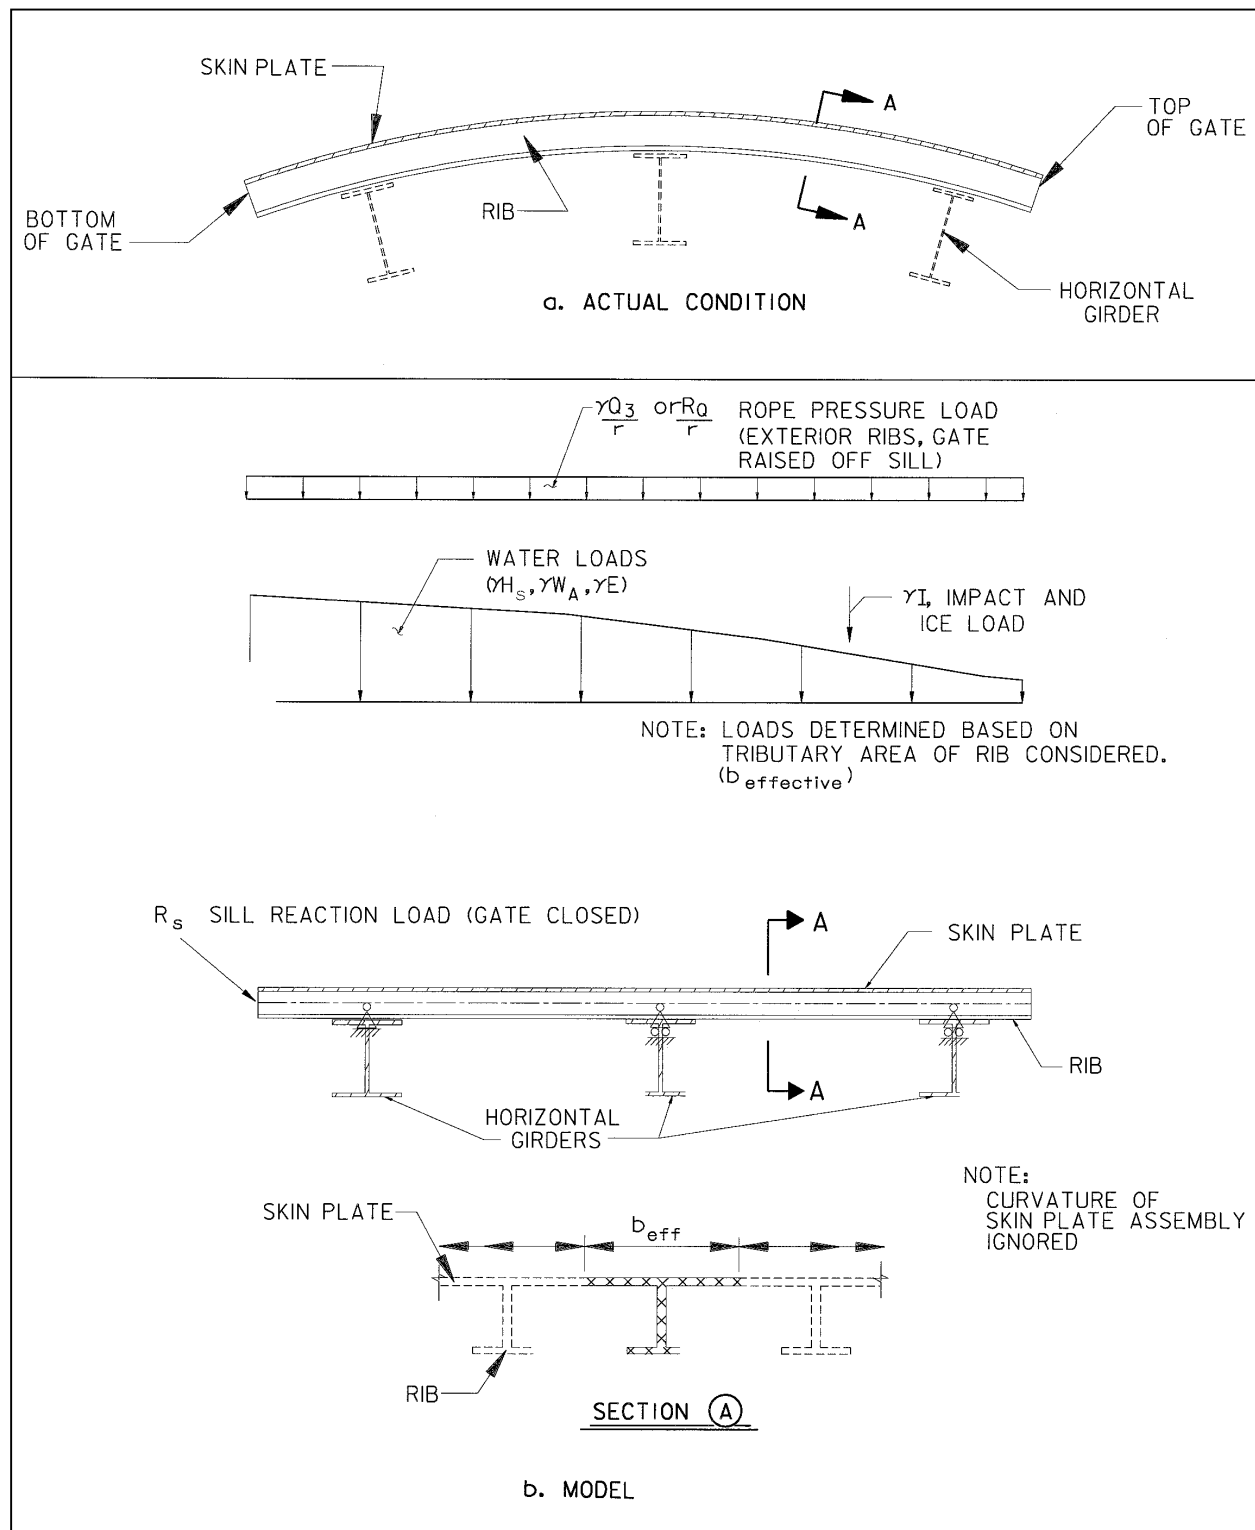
Skin plate assembly with ribs (2-D design model)
